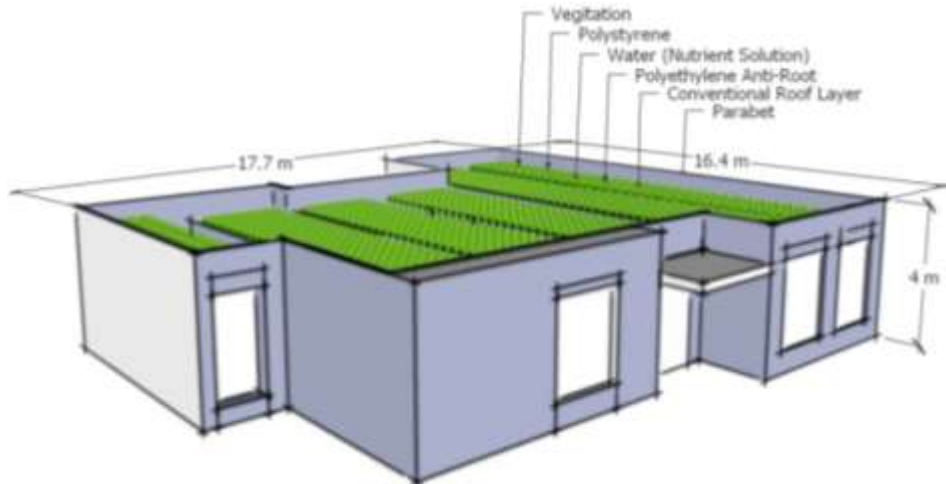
Sketch illustrating building with hydroponic roof using Batavia lettuce plants
